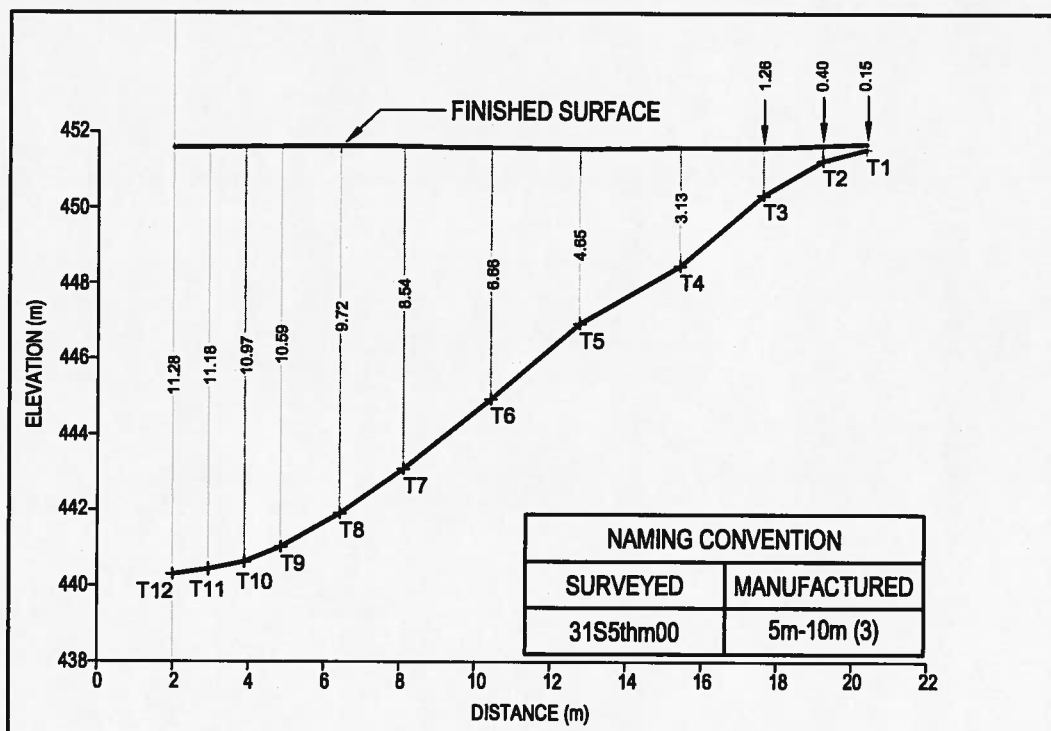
31S5thm00 (5m-10m (3)) - AS MANUFACTURED, PLAN, AND SECTION
